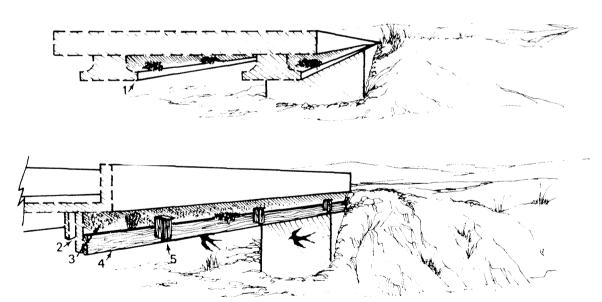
Concrete bridges can be designed to enhance their potential as wildlife habitat: (1) expanded beams for nest construction, (2) manmade crevice in which bats can roost and rear young, (3) roughened concrete to aid nest construction by some species of birds, (4) wooden plank to create a platform on which birds can nest, and (5) bird boxes to enhance use by a variety of birds.
